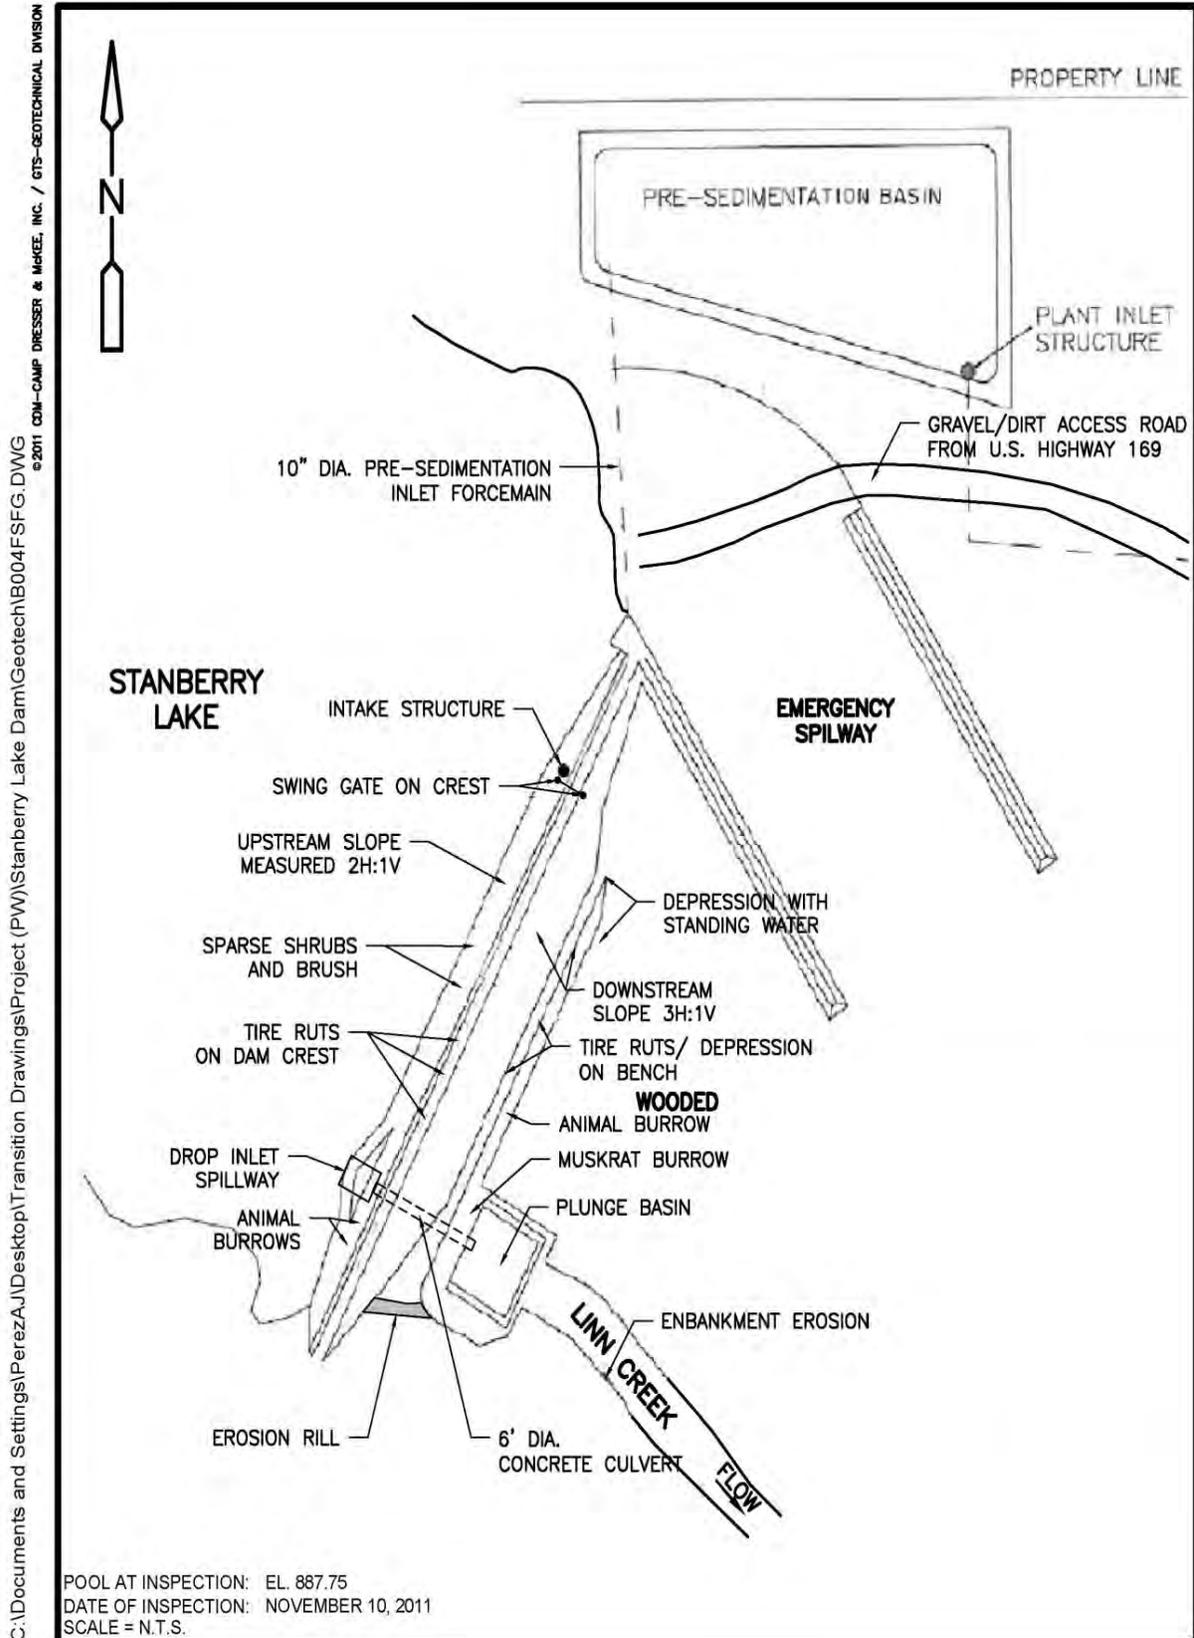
Field Sketch and Notes - Stanberry Lake Dam
